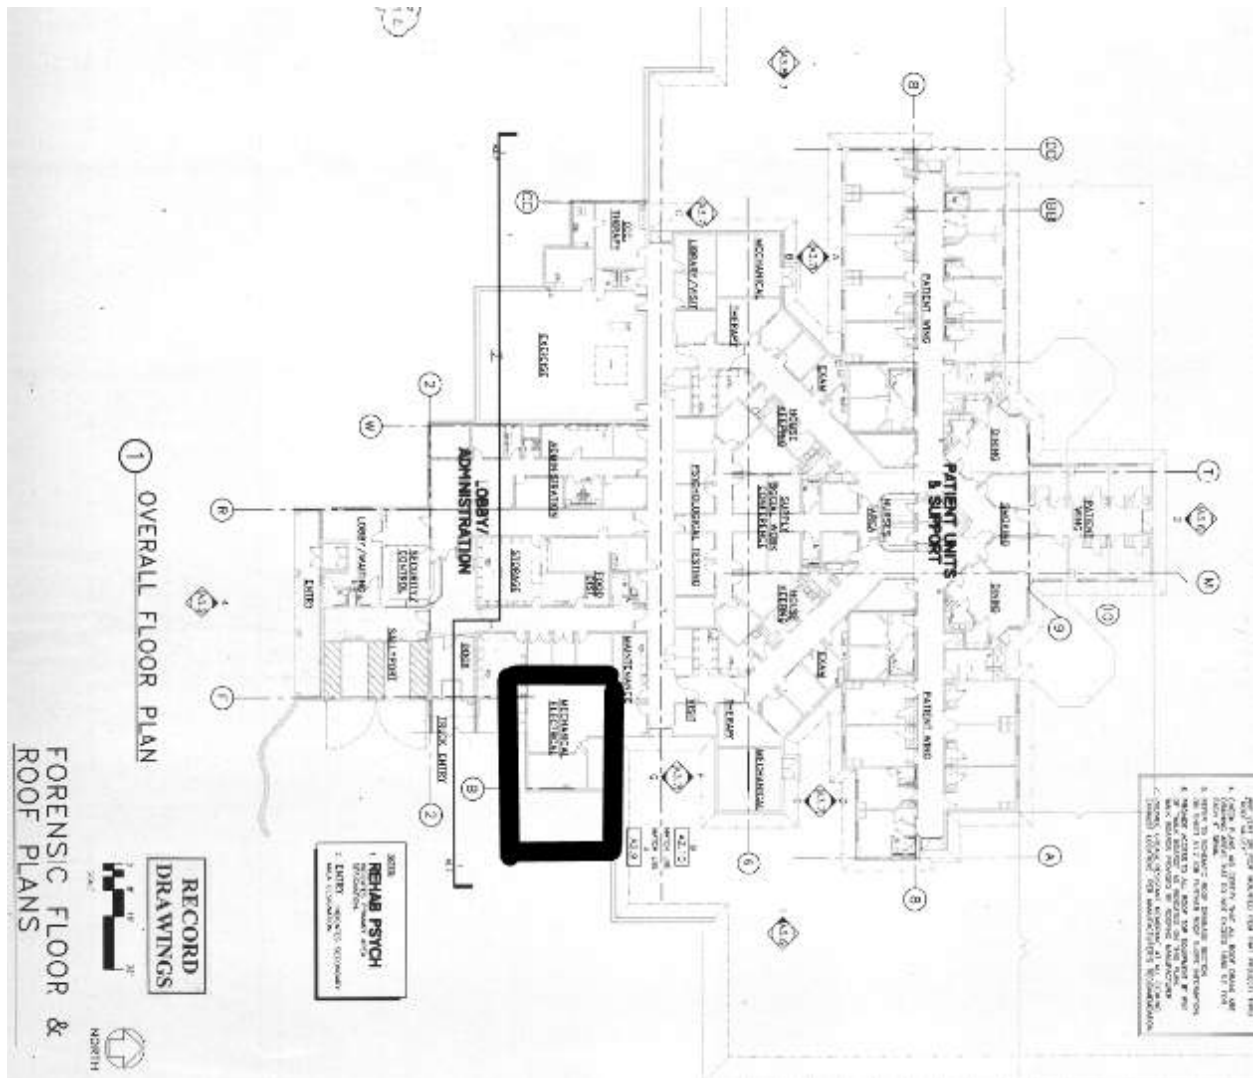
Forensic building floor plan. Electrical and generator rooms are inside the box.
